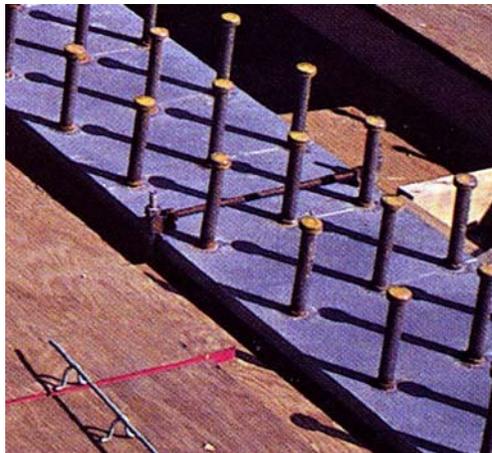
Three 7/8 in. (22.2 mm) diameter studs per row used on a steel beam
